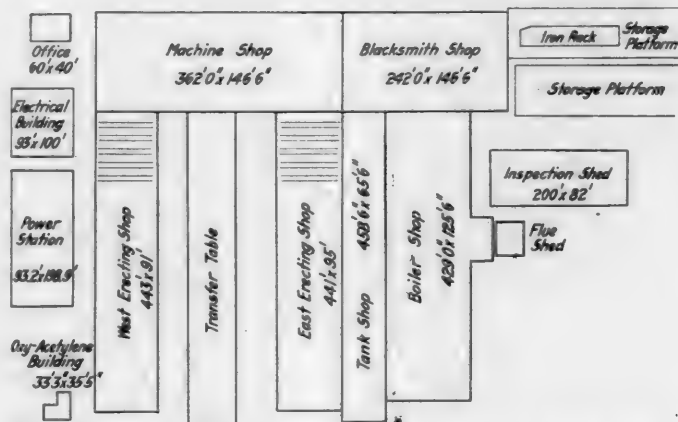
General Arrangement of the West Albany Shops of the New York Central
